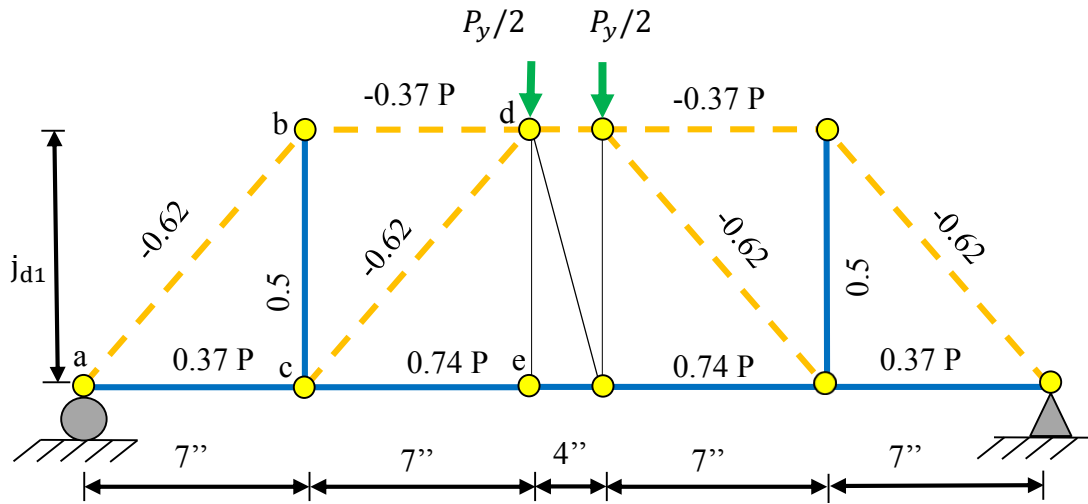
Truss 1 (concrete + steel) model of beam specimen (CSW-GSP)
